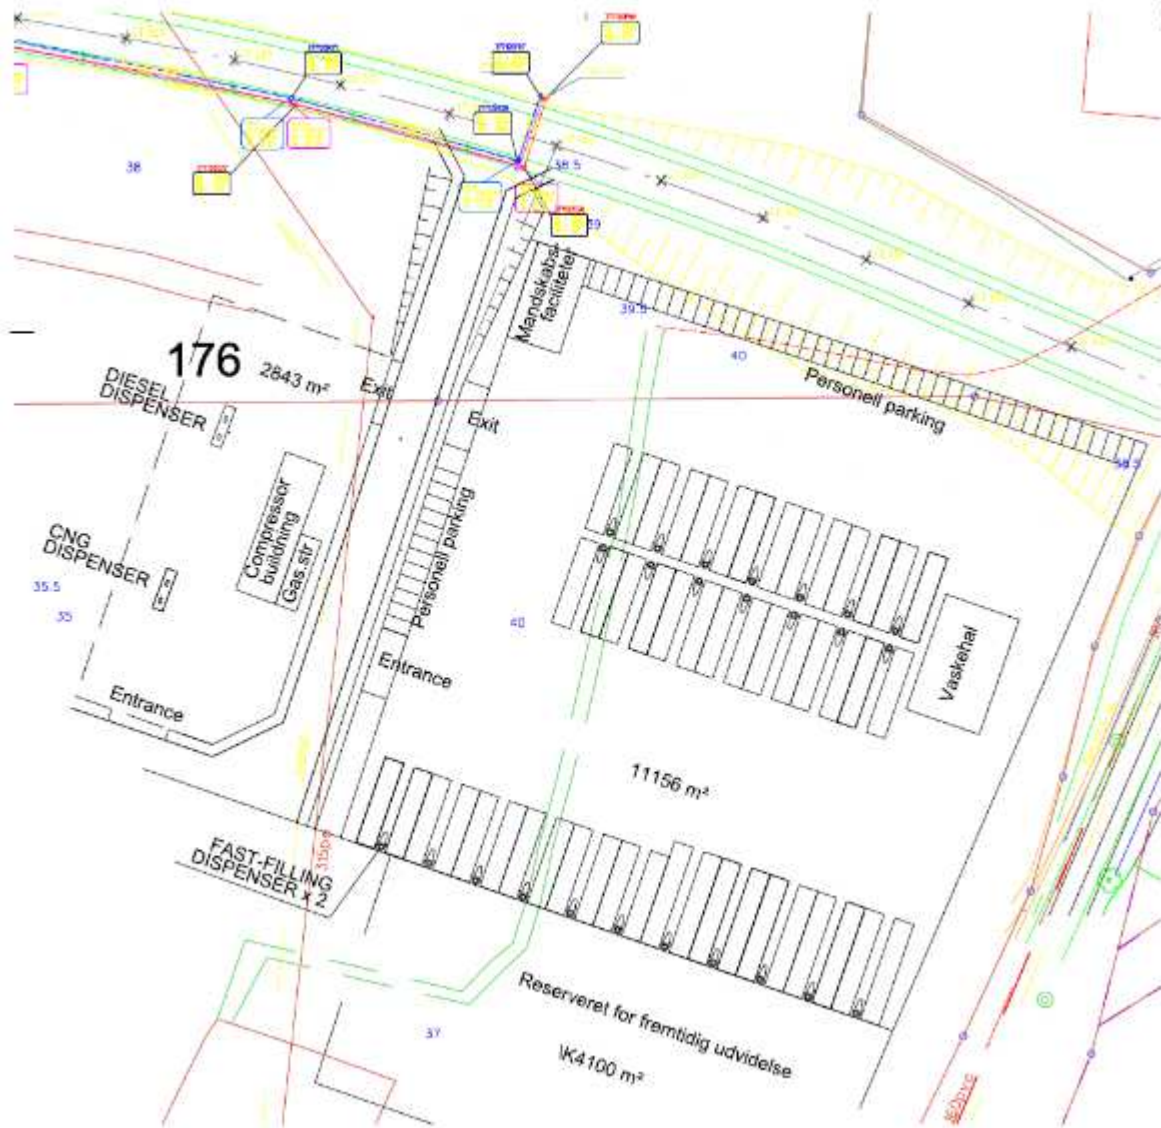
Schematic overview of the new gas filling facility<sup>7</sup>
